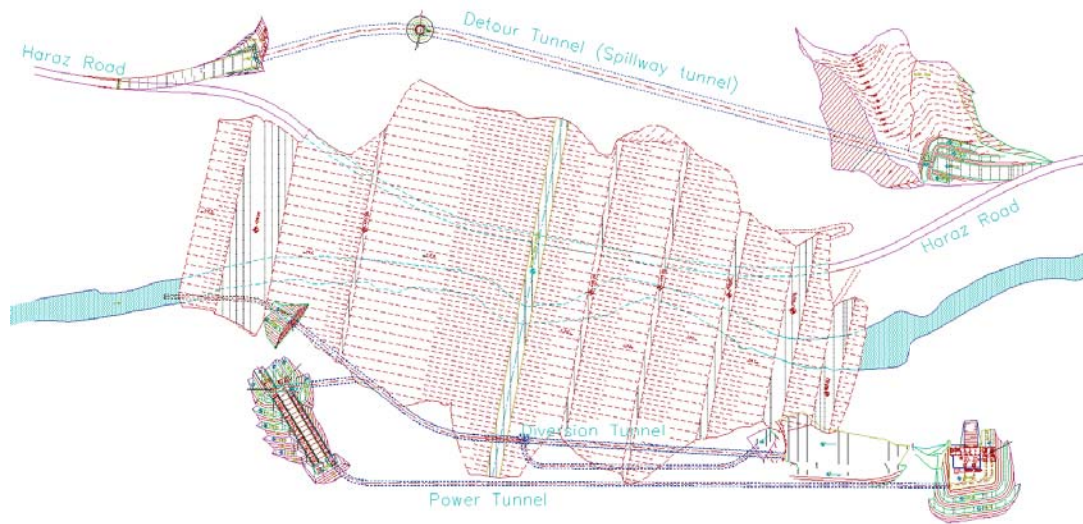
Layout of Dam Body, Tunnels and Haraz Road
